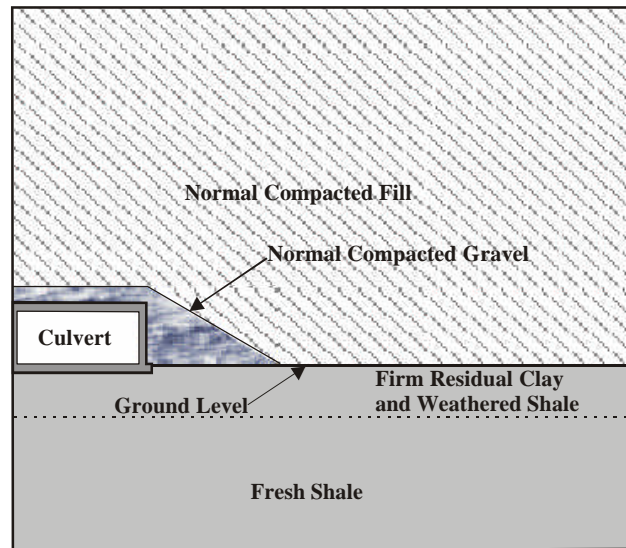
Assumed Backfill Conditions for Original Culvert and Finite Element Mesh (Original Culvert, Sullivan County, TN)
